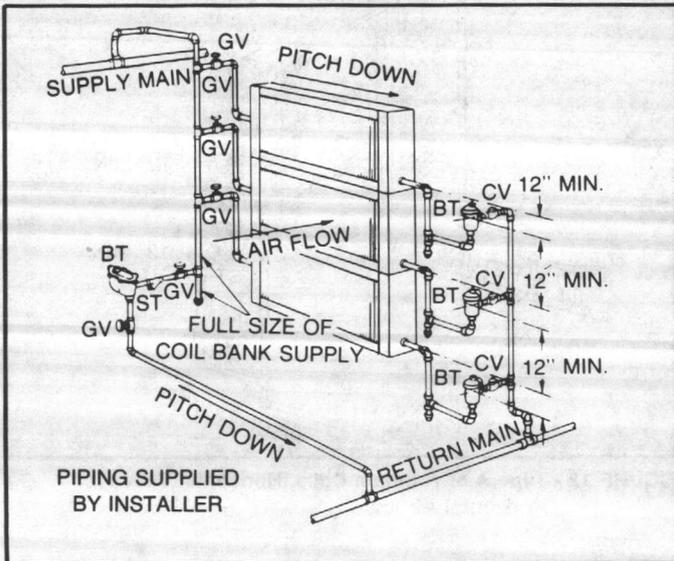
Type A Steam Coils, High Pressure, Horizontal Tubes for Horizontal Airflow
